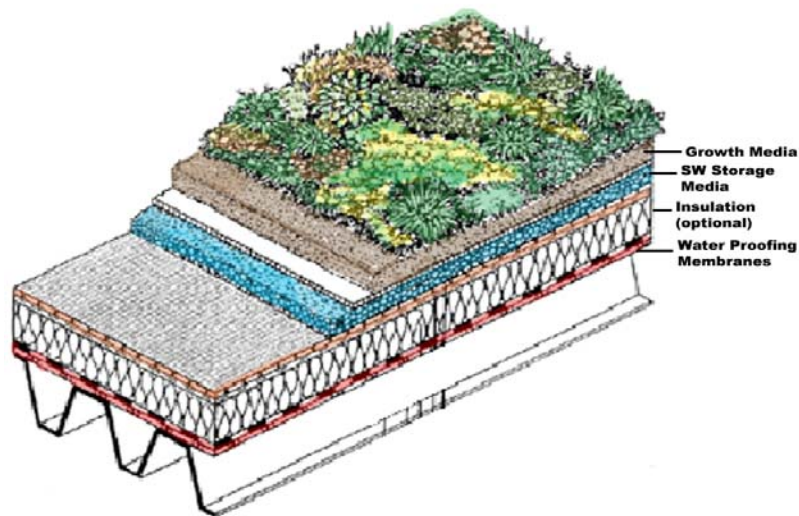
Cross-section diagram showing layers in vegetated roof system (Roofscapes, Inc.)
